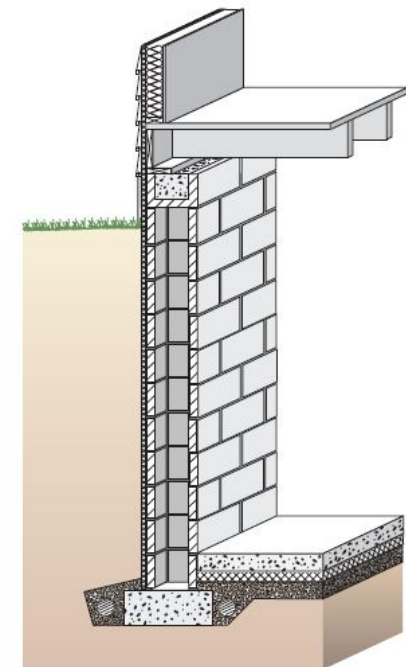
Concrete Masonry Basement Wall with Exterior Insulation
